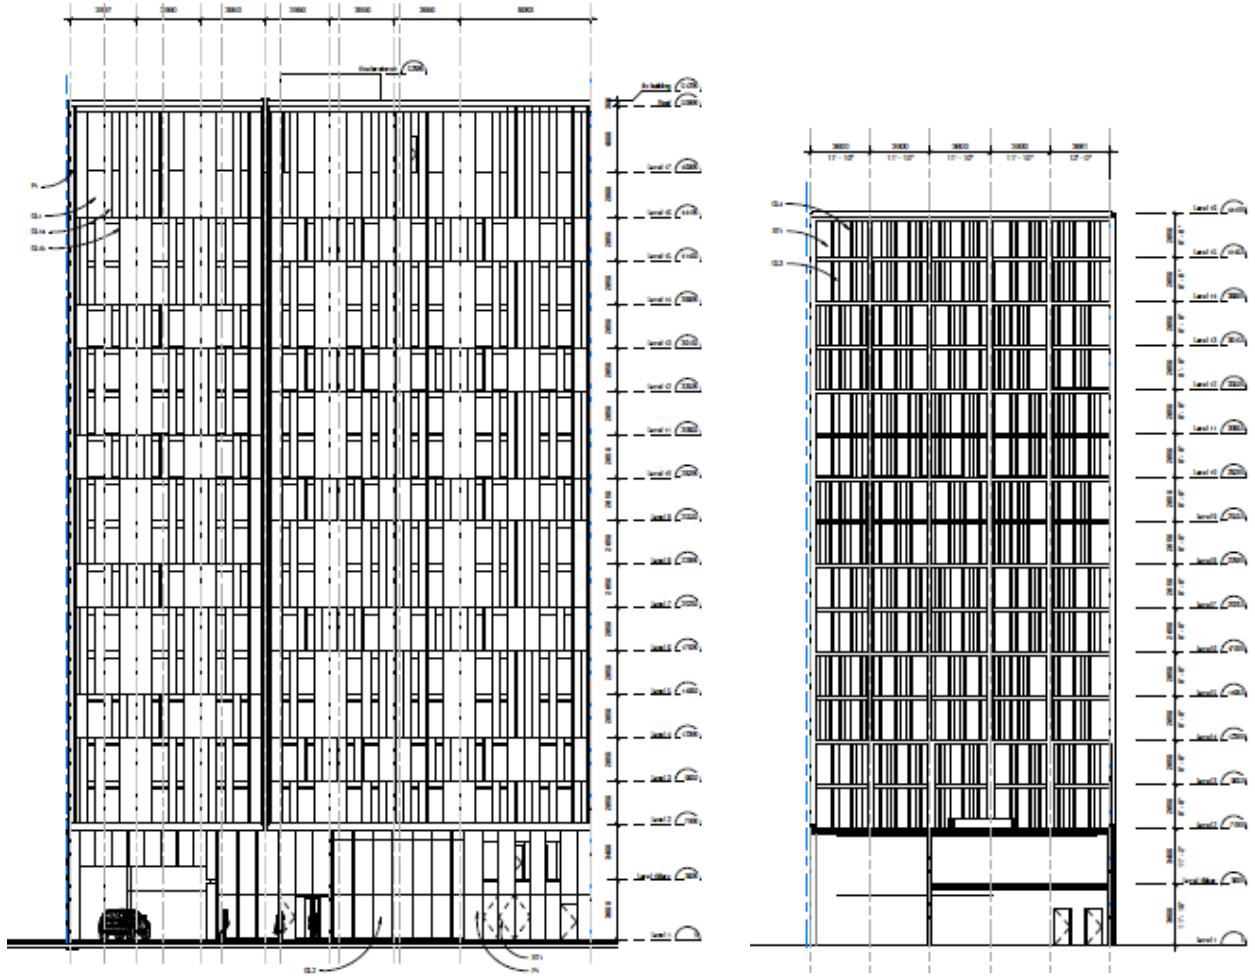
NORTH ELEVATION FOR 471 RICHMOND ST WEST (LEFT) AND 38 CAMDEN (RIGHT)
